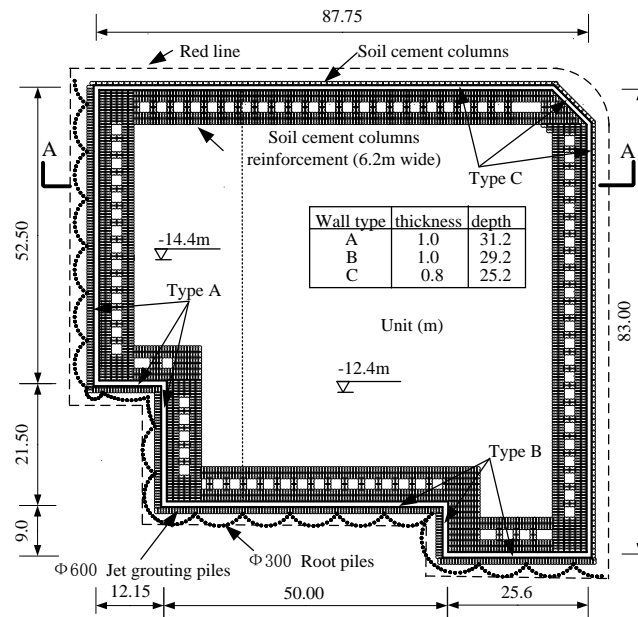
Plan view of the diaphragm wall (Xu 2007)
